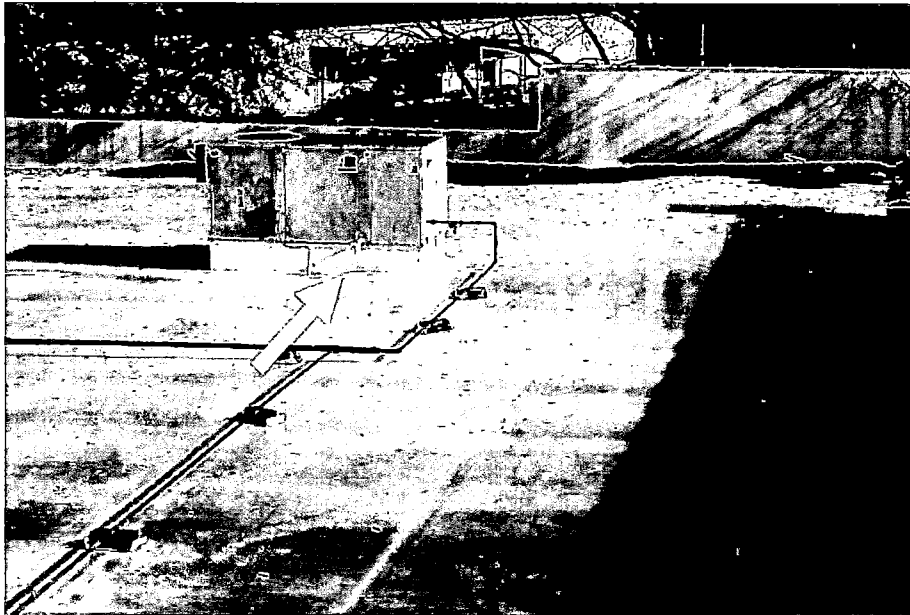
HVAC unit on roof of Books-A-Million. Note moisture staining on HVAC curb.
